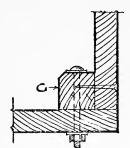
Details of Corner Joint of Kennel, showing Bolt and Nut
